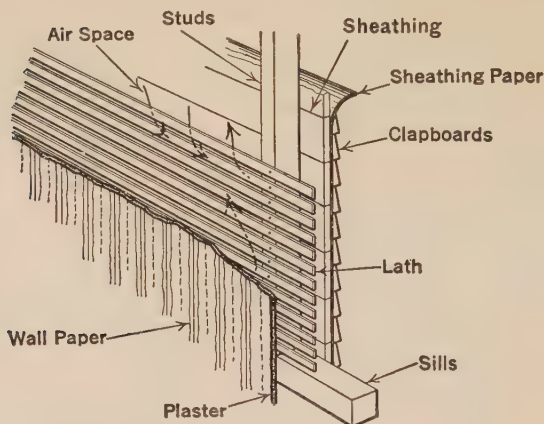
HOW HOUSE WALLS ARE BUILT TO KEEP IN HEAT.
